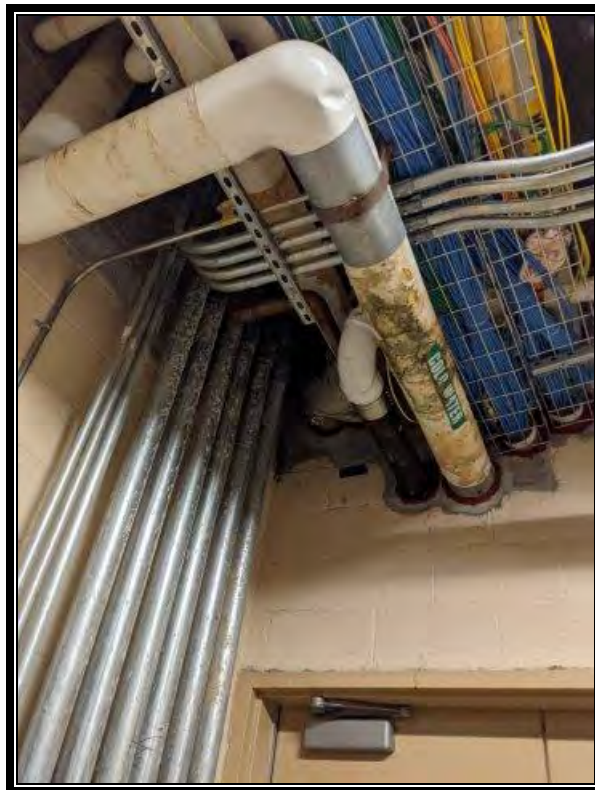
Non-ACM Mortar to Interior Wall CMU (Gray) and Fiberglass Insulation
